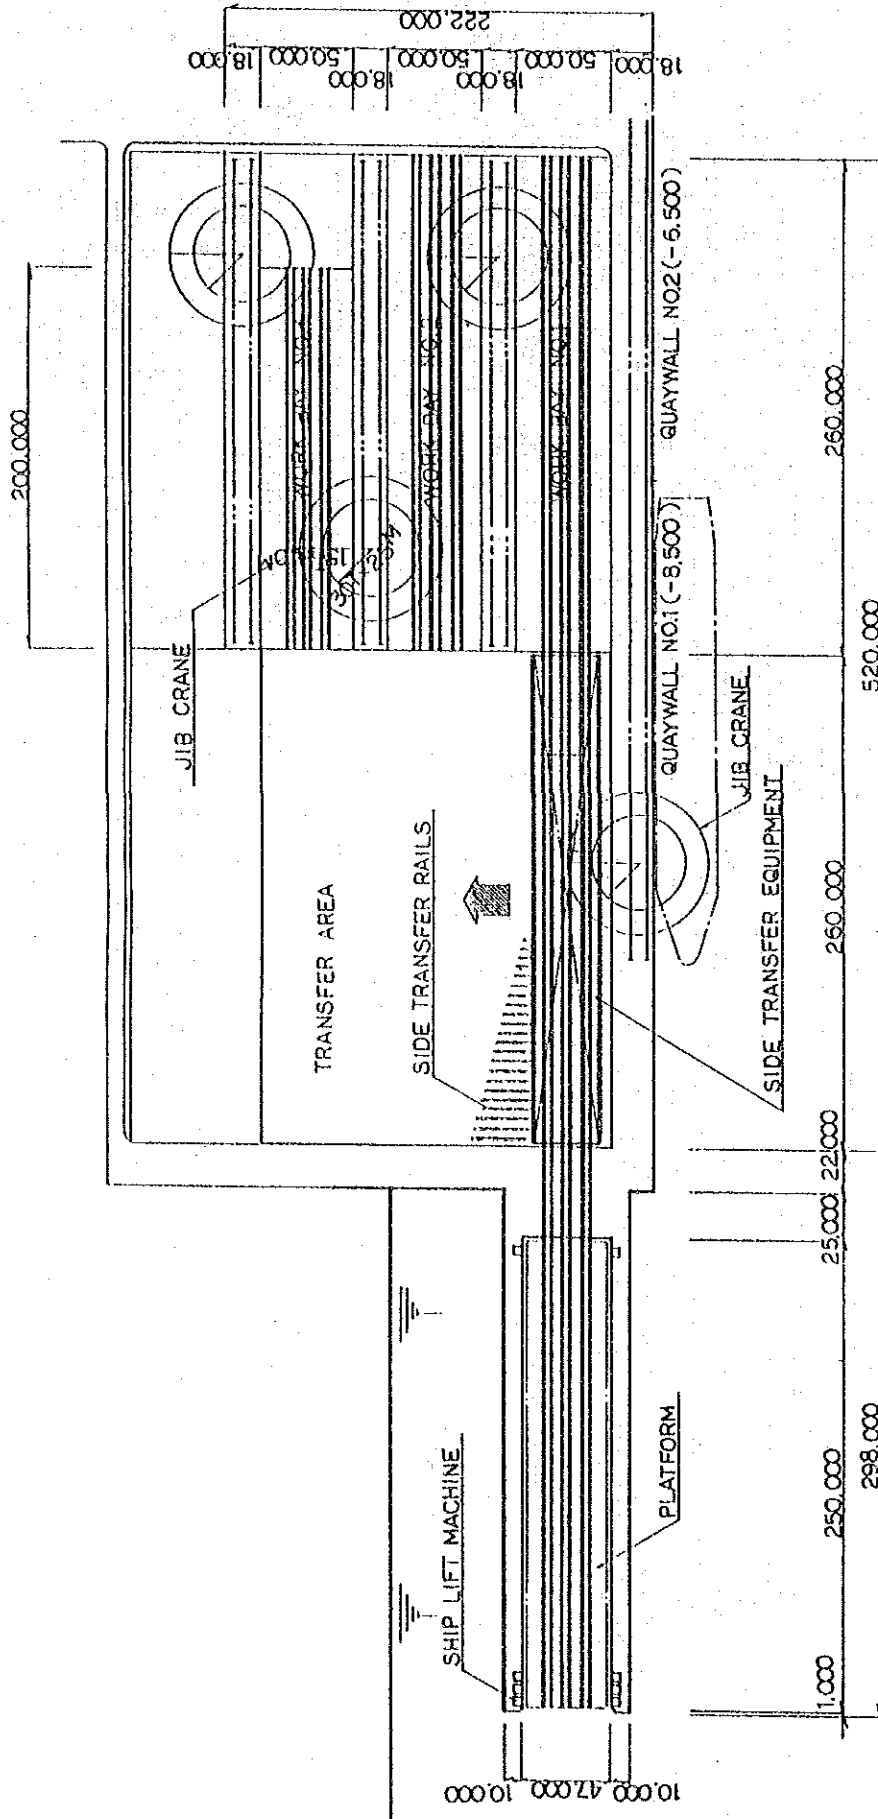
3. 4 SHIP LIFT SYSTEM PLAN
